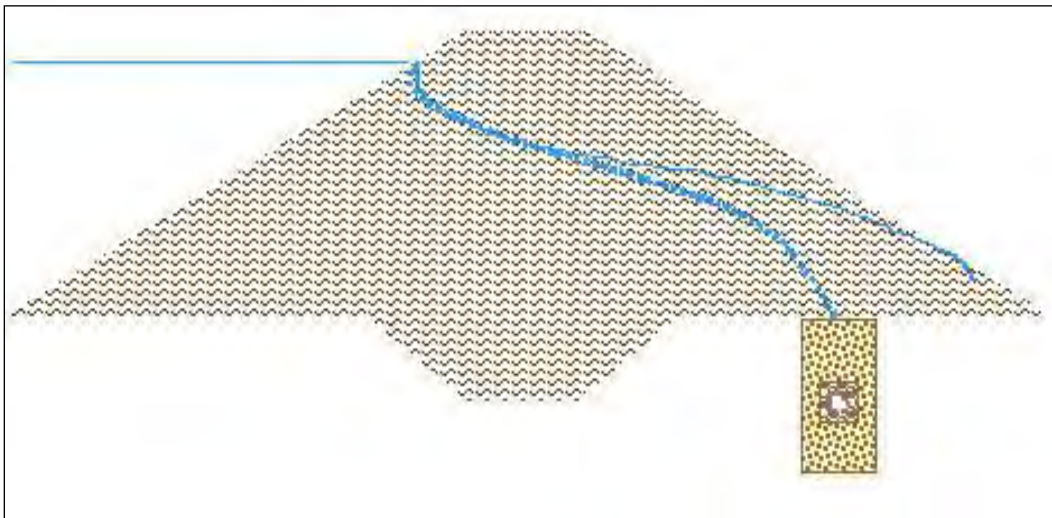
Foundation trench drain placed inside the downstream embankment section in an attempt to both collect foundation seepage and lower the phreatic line. In anisotropic embankments, this dual function is not likely to be successful.
